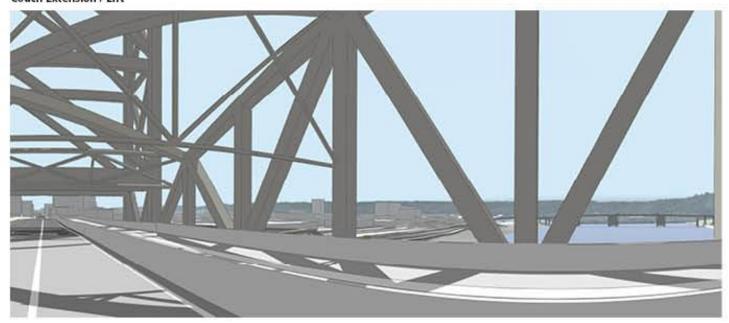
Visual Impacts – View from Burnside Bridge looking southeast – Cont.
